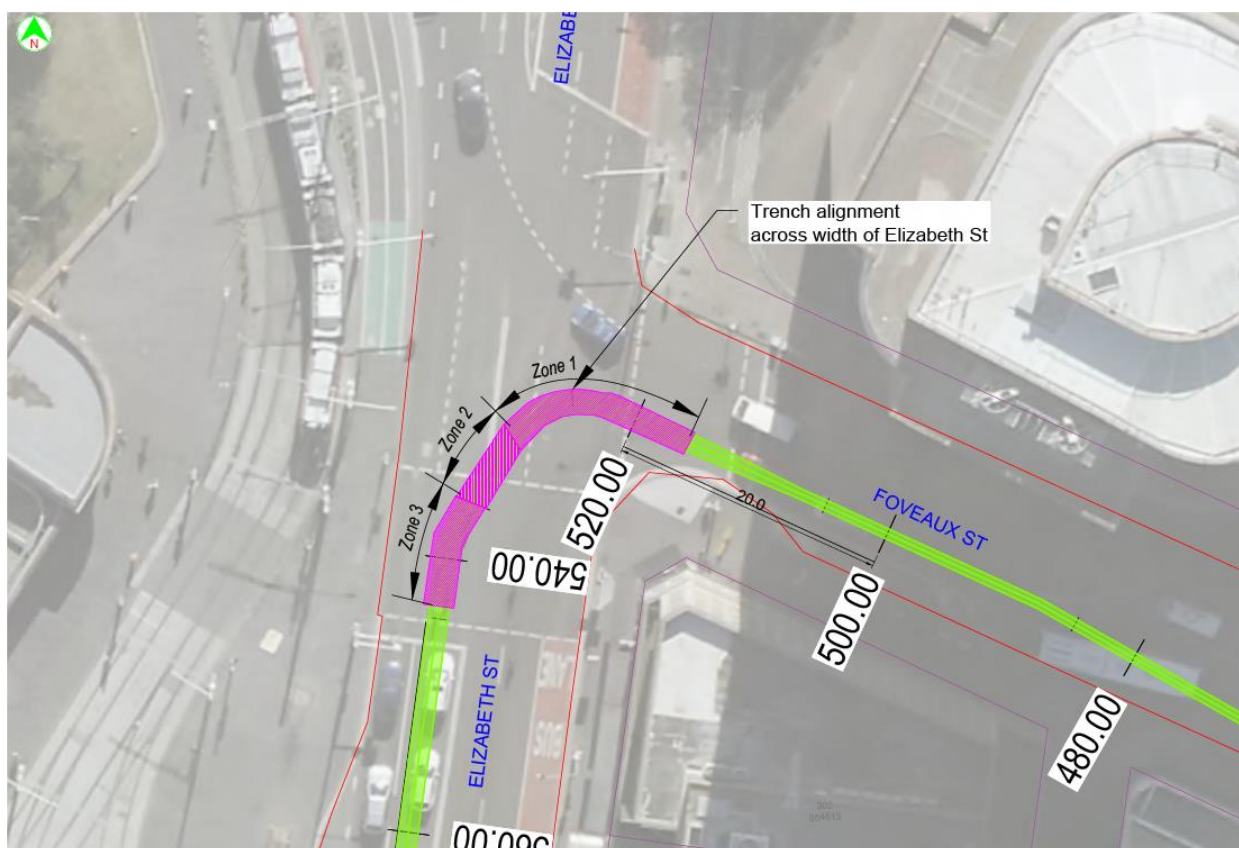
33kV trench section across Elizabeth St and Foveaux St intersection.
